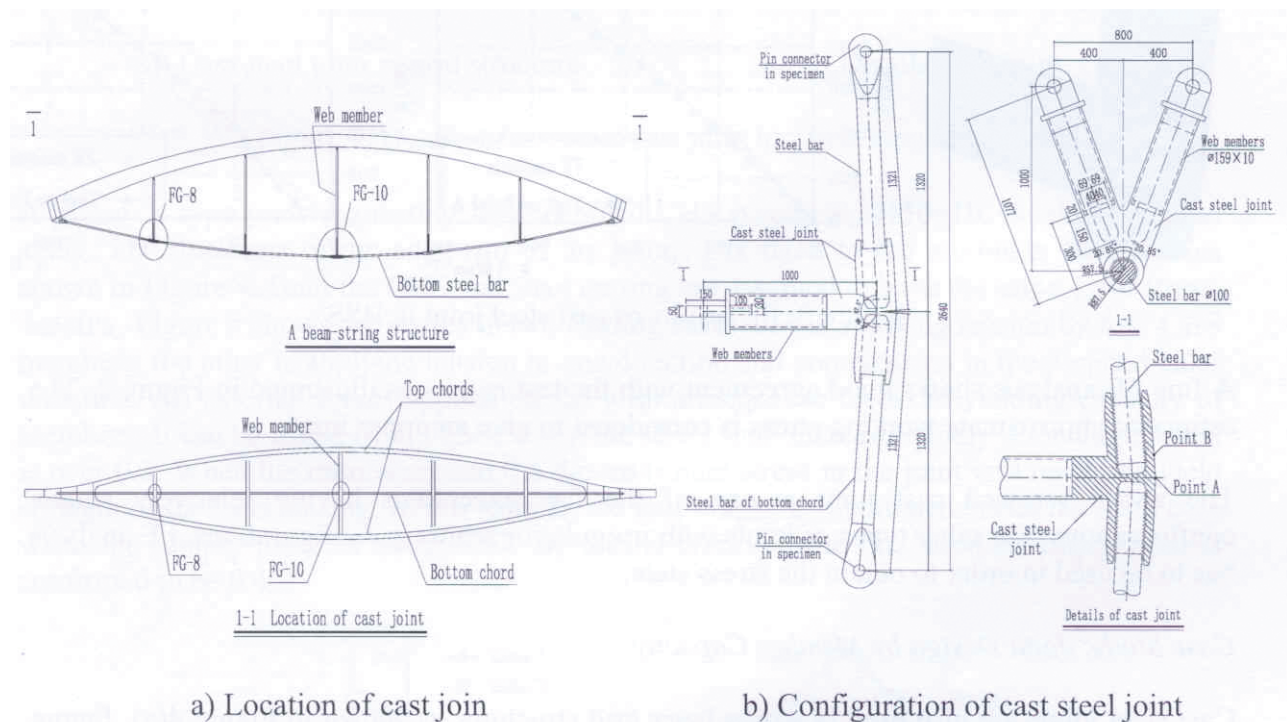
Beam-string truss in elevation and plan, along with cast steel connection detail. (Courtesy of Professor Y.-Y. Chen)
